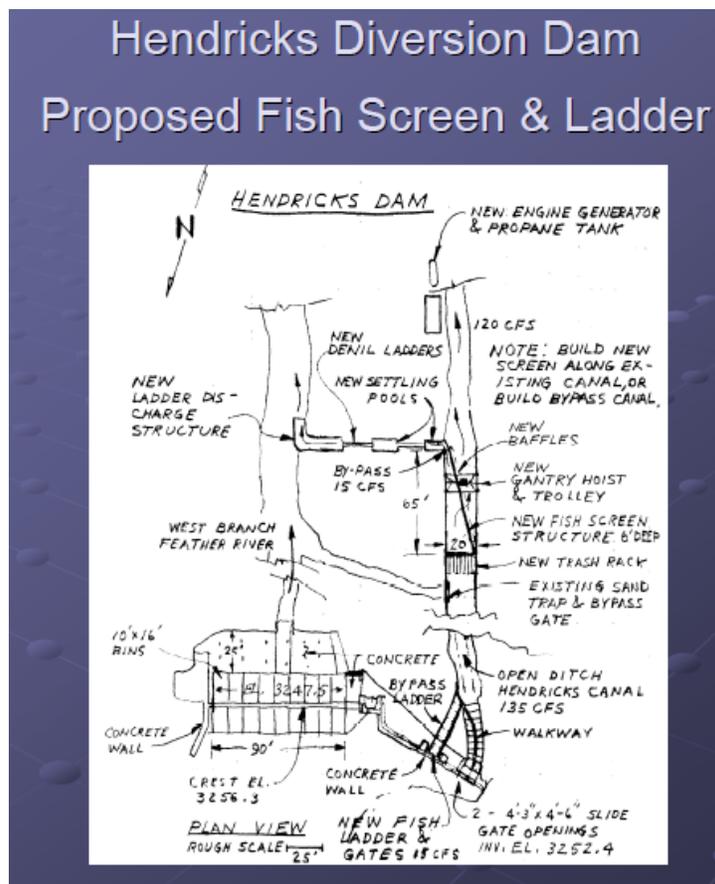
Plan view of Hendricks fish screen and ladder⁹
